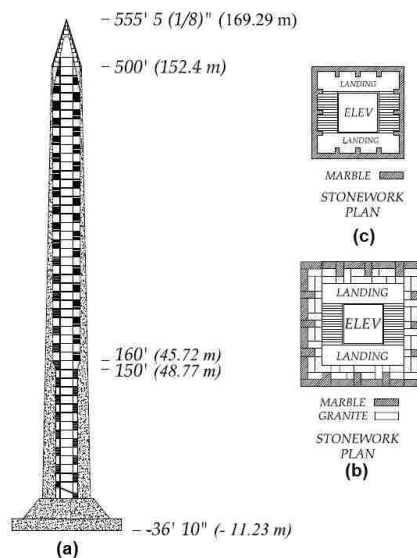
Washington Monument: (a) vertical section through north and south walls, (b) horizontal section at 180 ft. (54.9 m) level, and (c) horizontal section at 480 ft. (146.6 m) level
